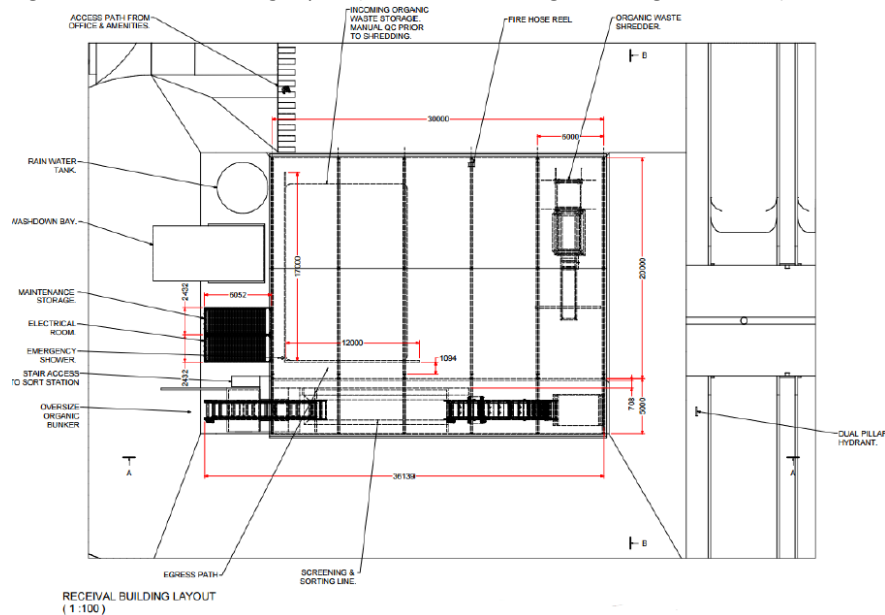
Receival Building Layout (Source: Soilco Design Drawings, 08/07/25)
